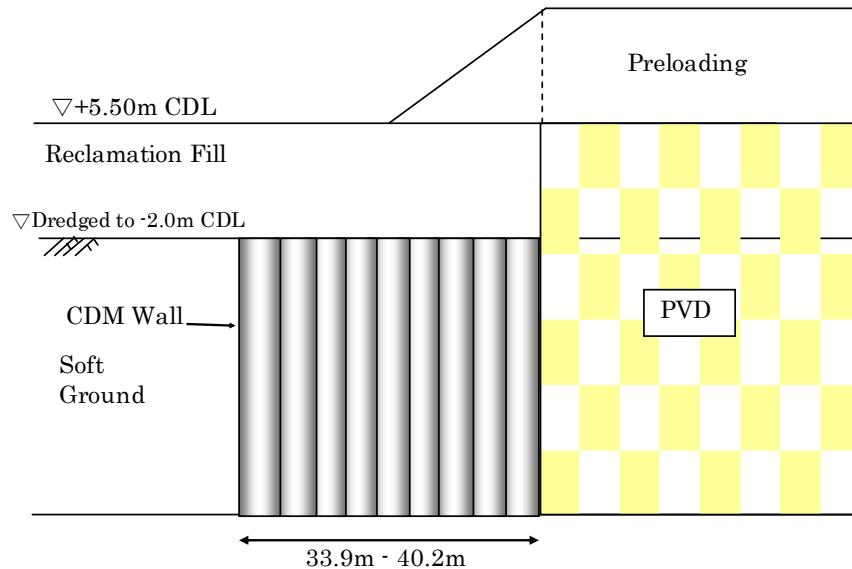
Proposed Arrangement of Cement Deep Mixing Method
